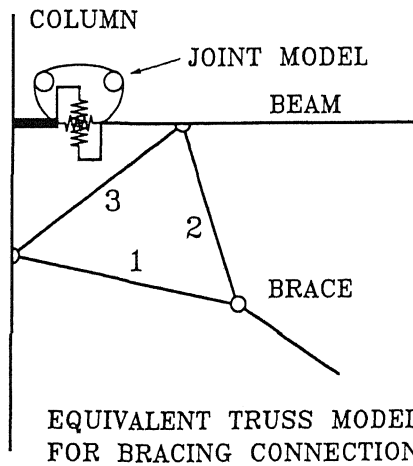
Beam-to-column joint and bracing connection phenomenological models.
